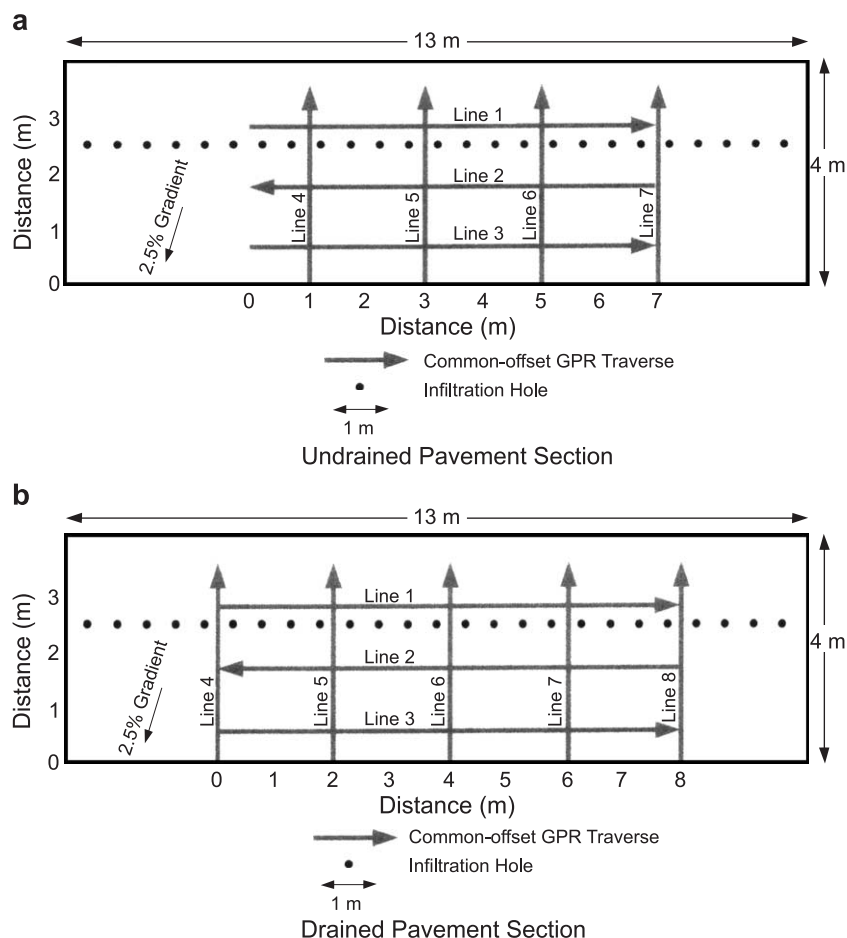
Map view of the experimental pavement sections showing the locations of the infiltration holes and the GPR traverses. (a) Undrained pavement section and (b) drained pavement section.
